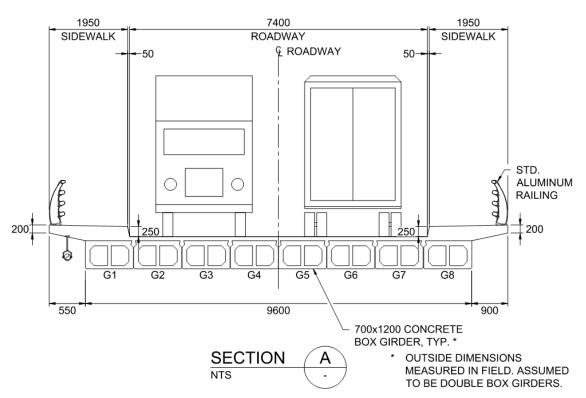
Cross Creek Road Bridge over Harvey Creek - Section
